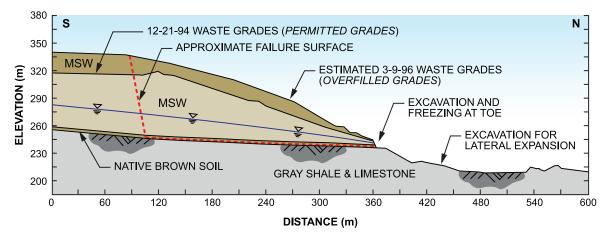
(Color) Idealized, representative cross section through Rumpke Landfill showing prefailure geometry, extent of overfilling, and location of failure surface. (Adapted from Stark et al. 2000.)
